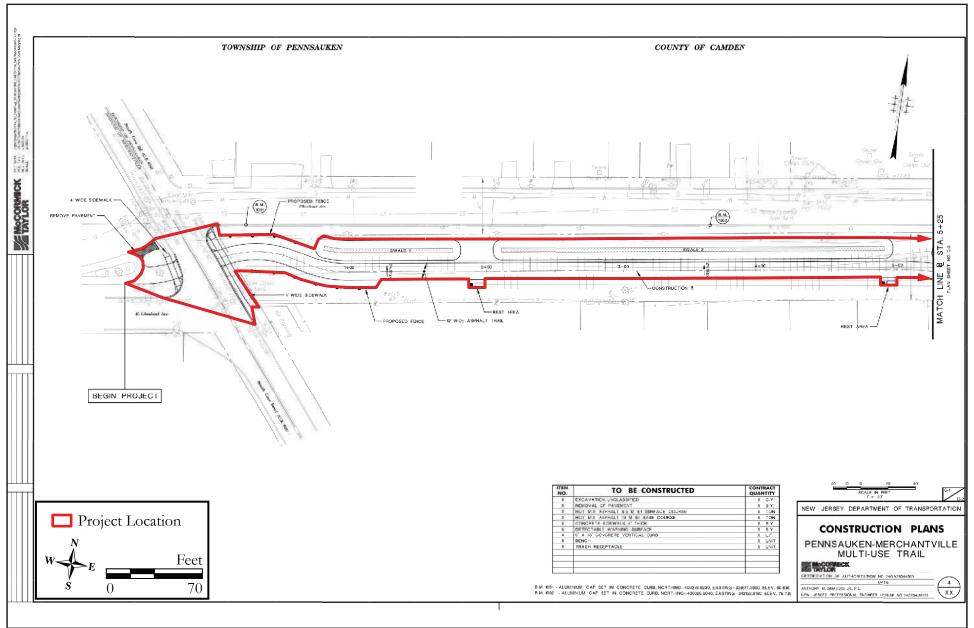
Construction plans, Sheet C-1 (from McCormick Taylor 2020).
